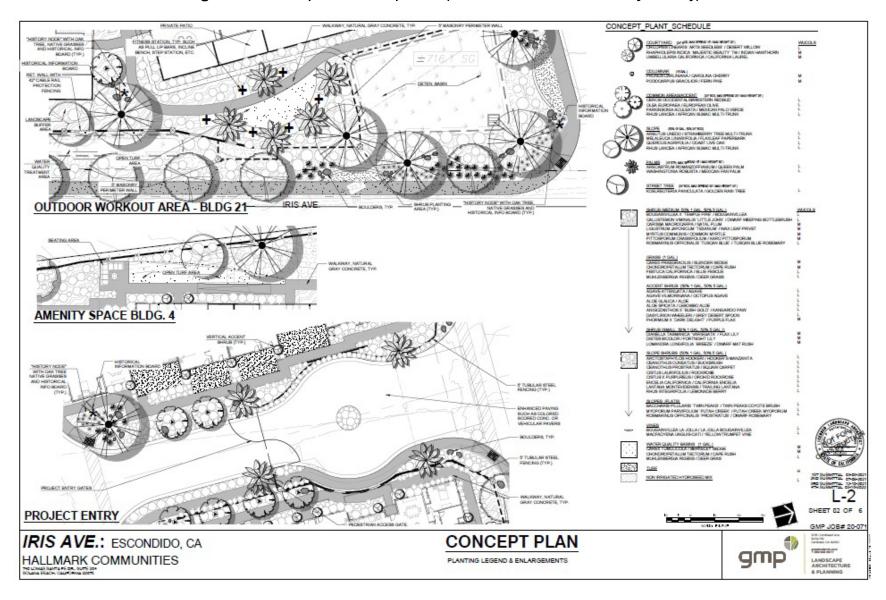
Conceptual Landscape Plan (Outdoor Workout Area and Project Entry)
